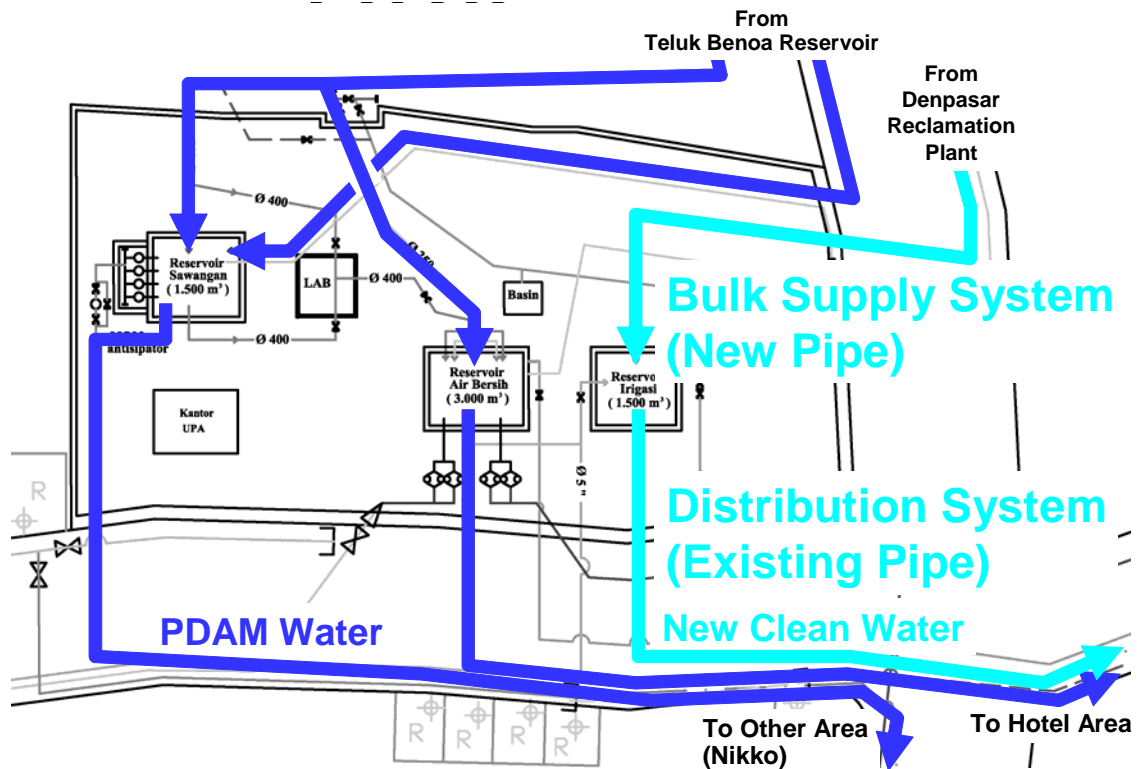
Existing Reservoir for Reclaimed Water and Distribution Piping
